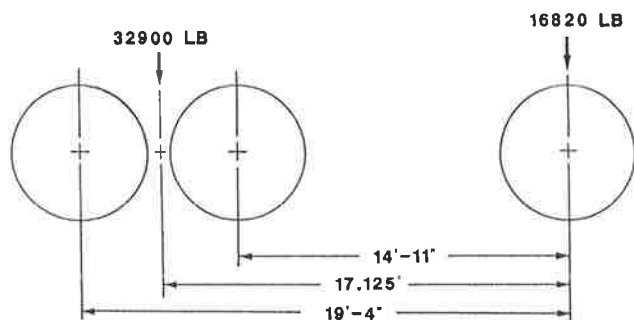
TEST VEHICLE DIMENSIONS AND LOADS
